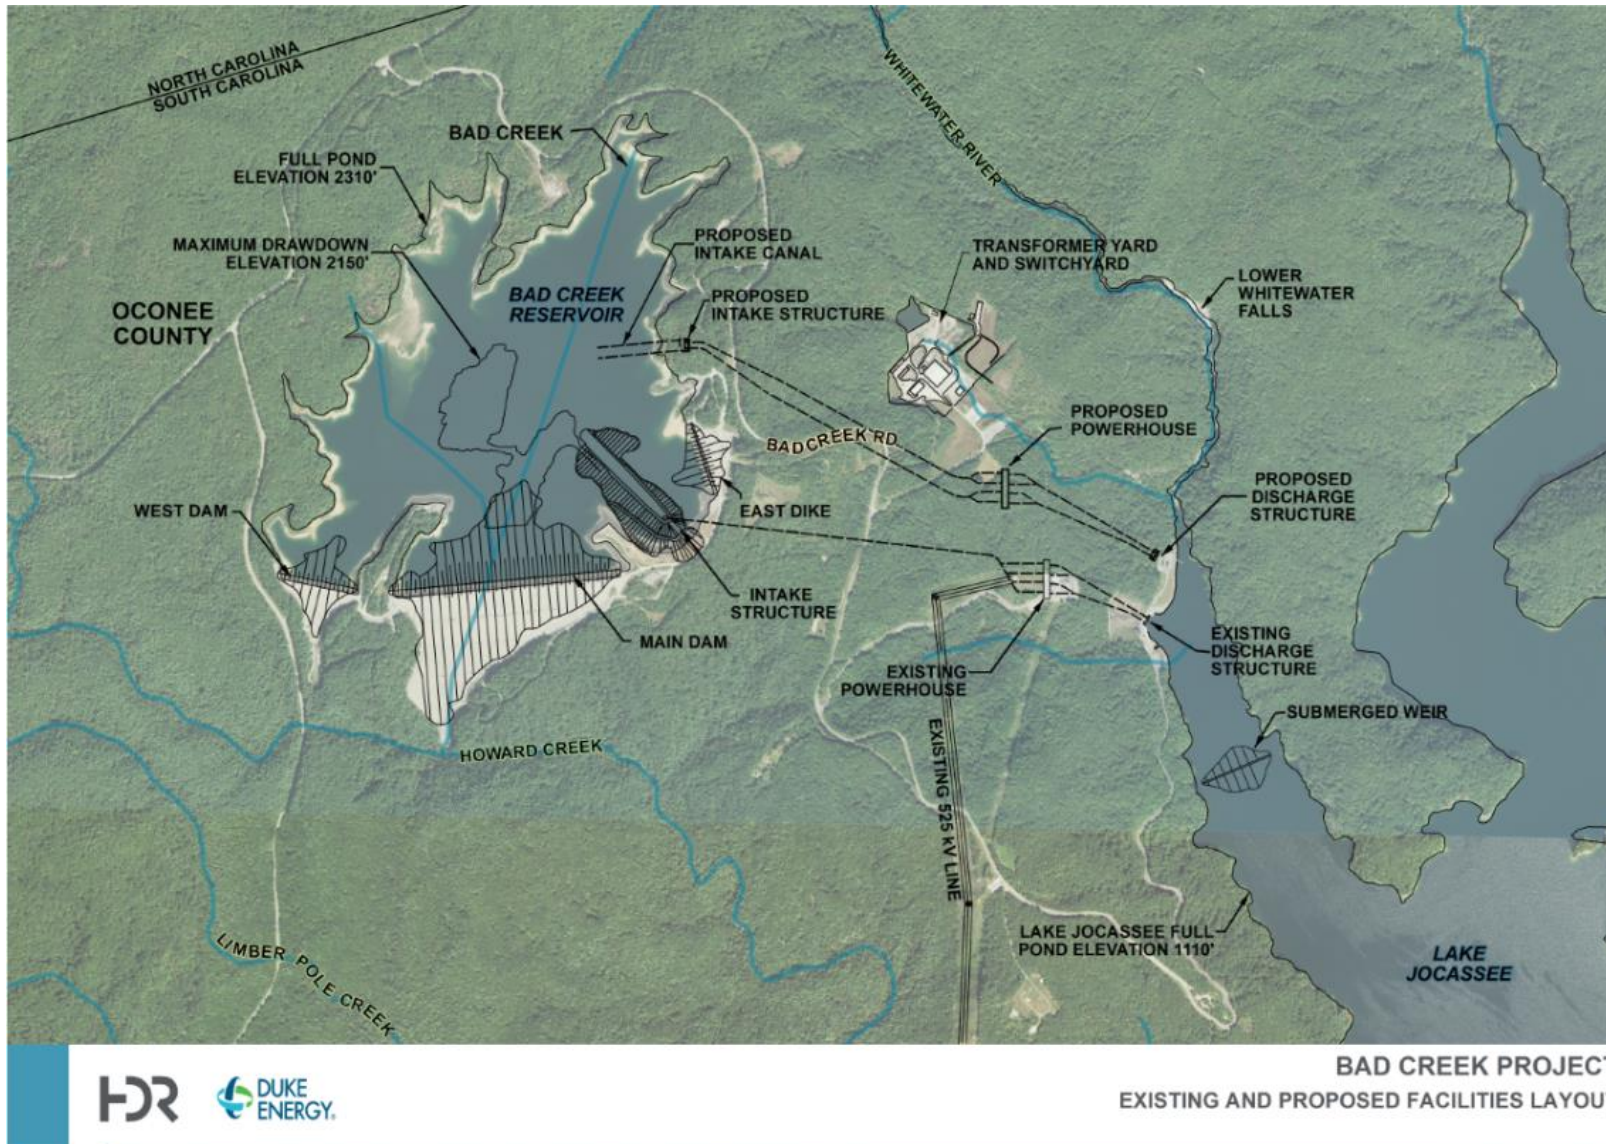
Proposed Bad Creek II Complex Facilities Layout (Major Existing Bad Creek Project Facilities also Shown)
